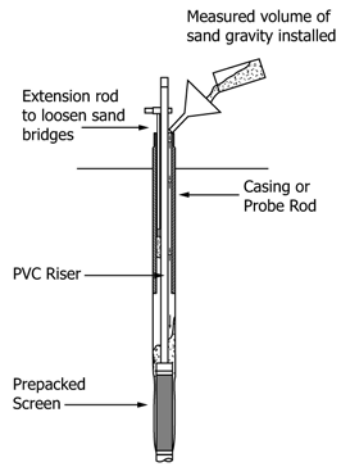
One method to construct the grout barrier is by pouring medium to fine grained sand through the casing annulus. If any bridging occurs an extension rod or jetting with water may be used to re-open the well annulus.
